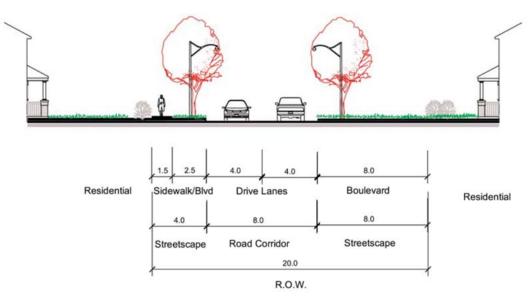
THE QUEENSWAY, KSP PROPOSED CROSS-SECTION (NORTH OF MORTON AVENUE)
